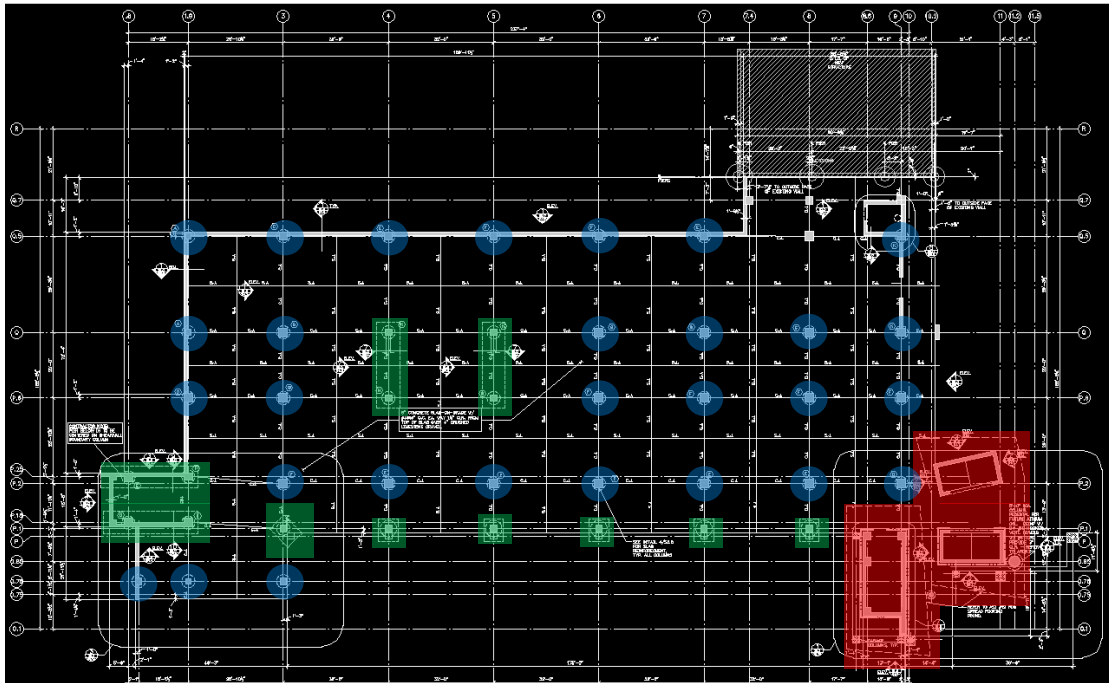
Foundation Plan highlighting the footings and drilled piers.
